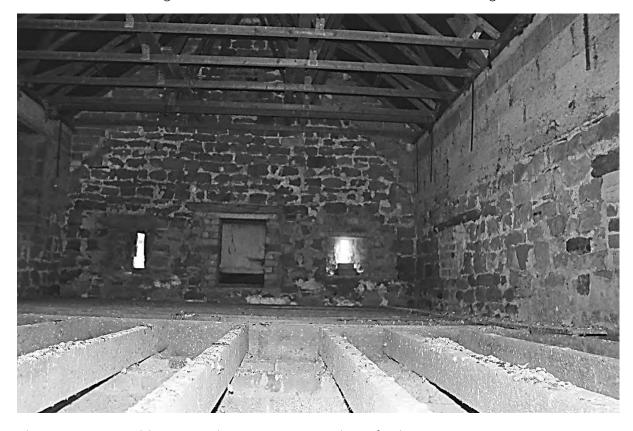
Farm Building 1 North: Room 1.3 Raised Roof (Film 2/6). Facing East.
